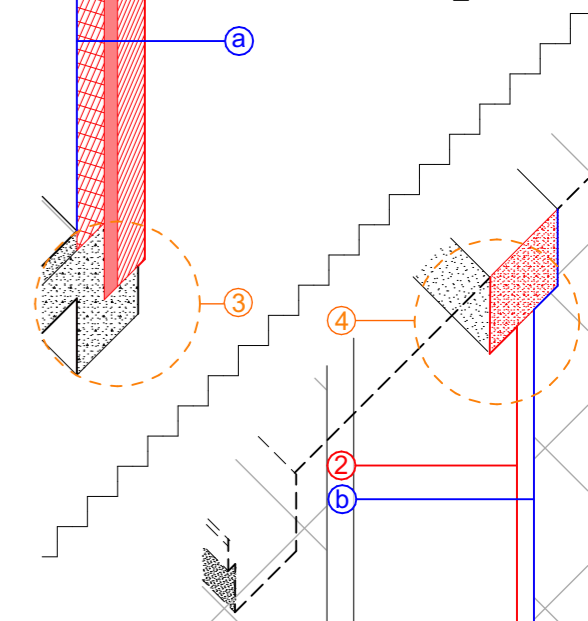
OF BUILDING ENVELOPE @ BEDROOM_1:20
